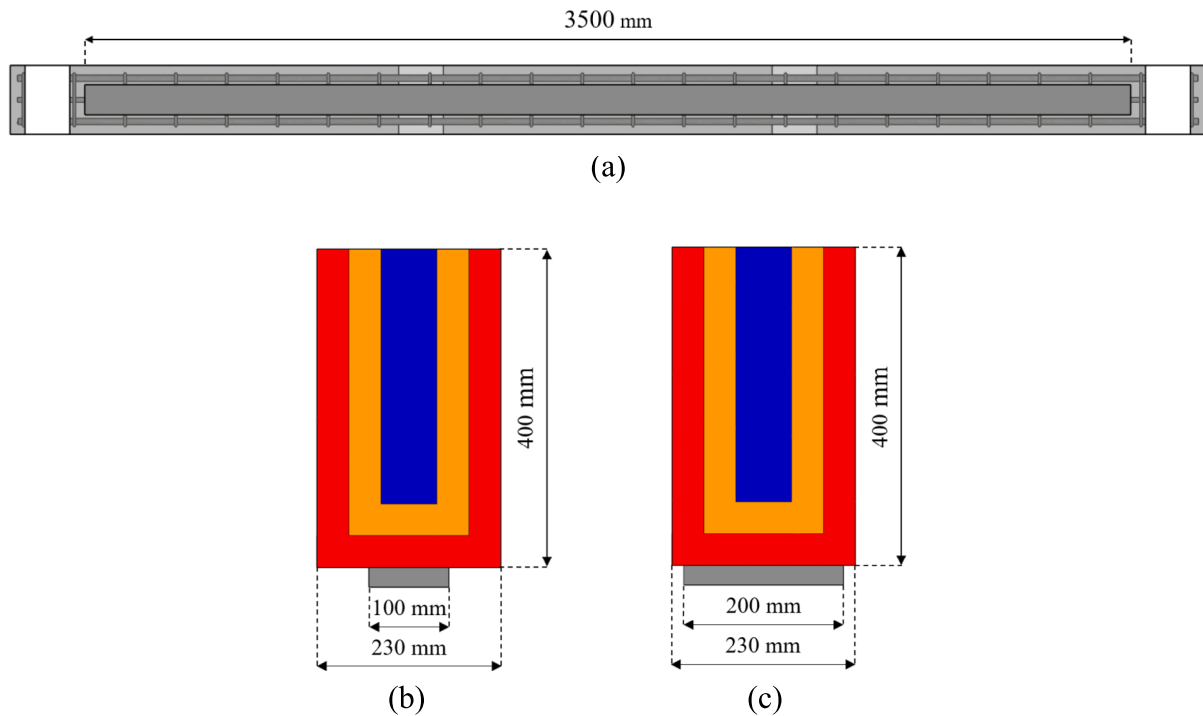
Strengthening schemes of fire-damaged beam. a Strengthening length. b Strengthening width of 100 mm. c Strengthening width of 200 mm
